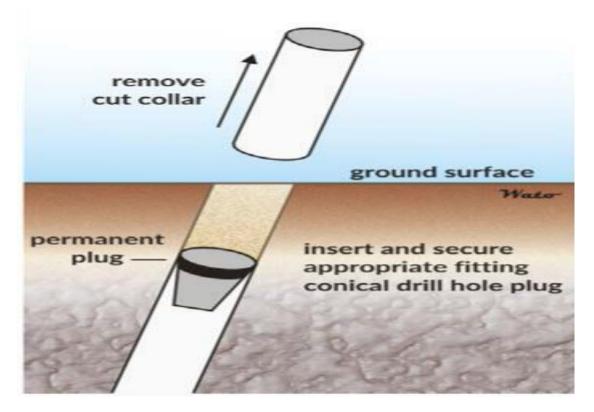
Showing the PVC collar cut at 1 m below the earth surface, the cap is then installed.
